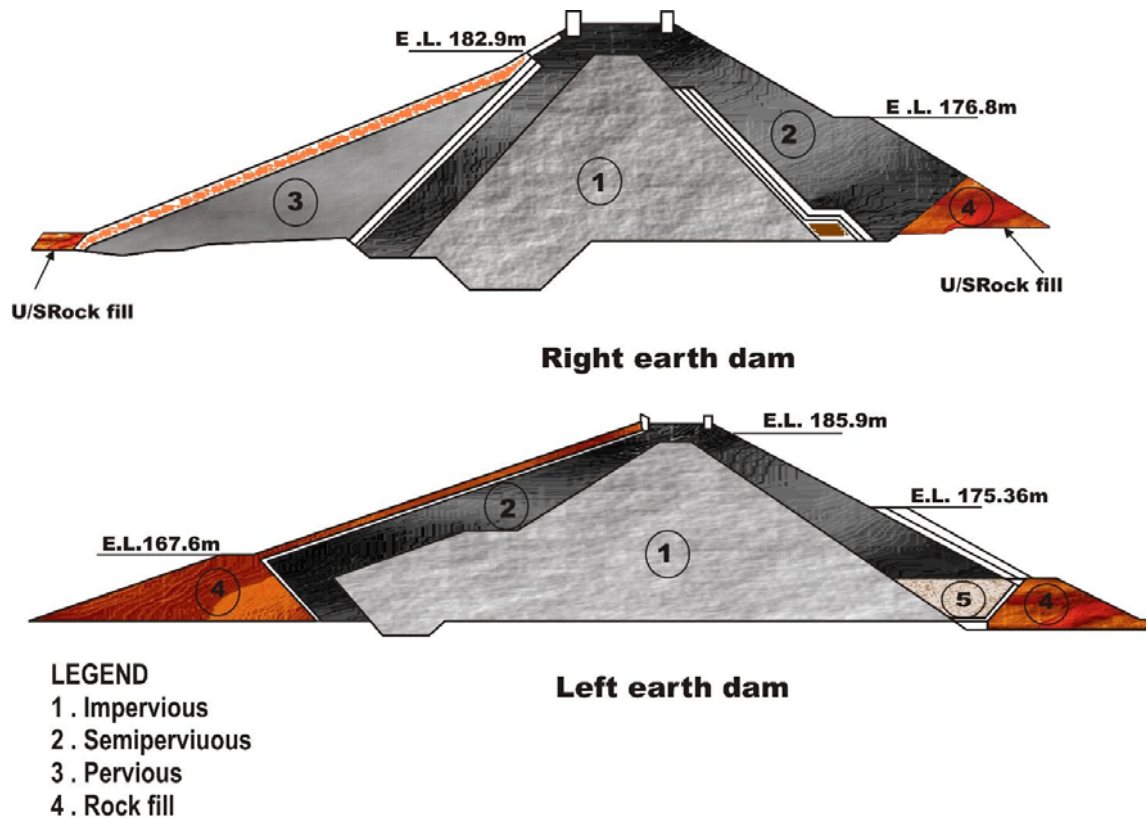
Maximum section of embankment dams of Nagarjuna Sagar project
